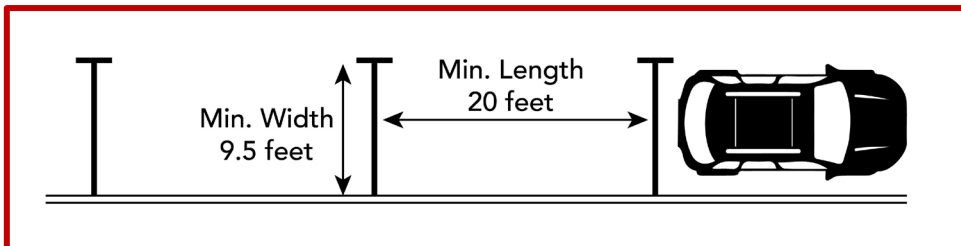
Parking Stall and Aisle Way Dimensions, Parallel
